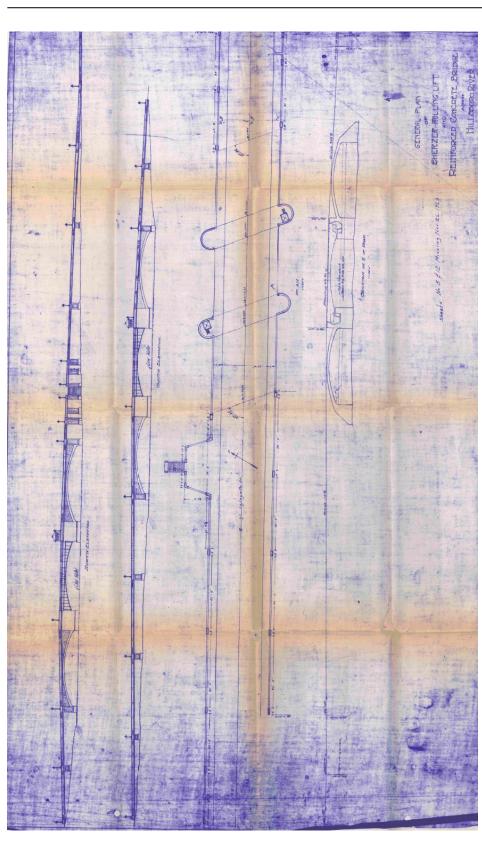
General Plan of the Lafayette St. Bridge., 1912
